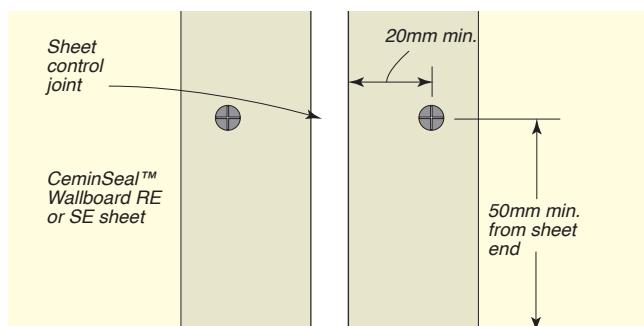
Fastener Positioning – CemintSeal™ Soffit Sheet
